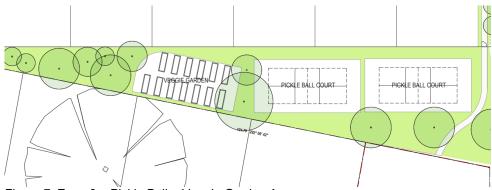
Zone 3 – Pickle Ball + Veggie Garden Area
